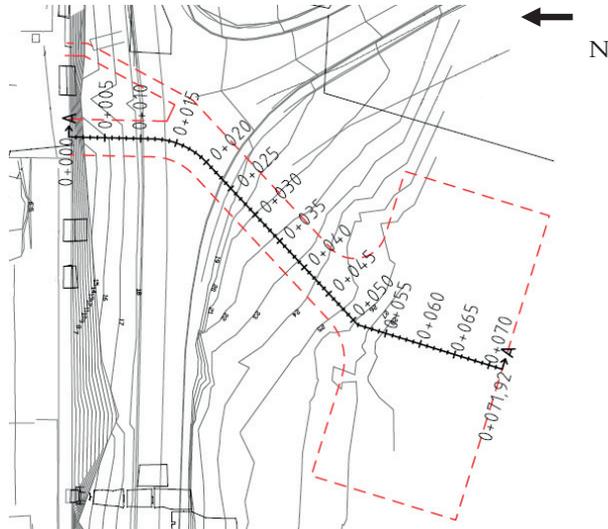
Layout of Veidekke access tunnel and gallery excavated at Norra Djurgården, Stockholm (Karlsson, 2014).
